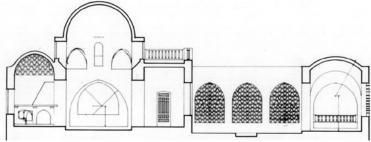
Cross-section shows thick walls and different types of roofing to meet thermal solutions, in addition to the interesting internal spaces.
